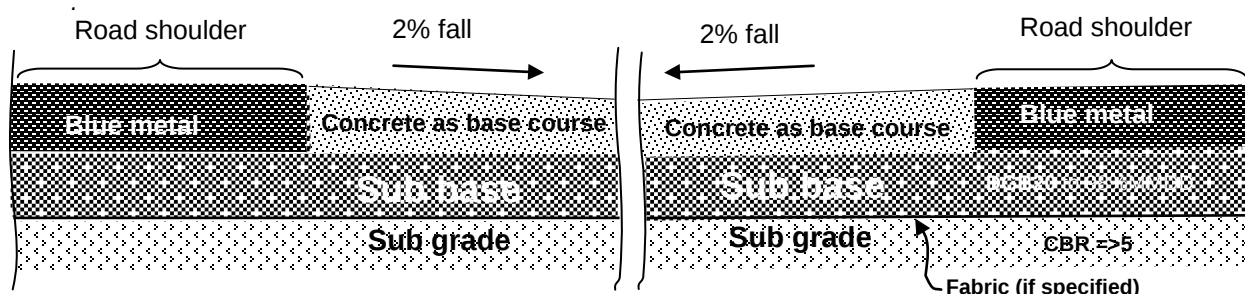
Cross section of typical general road layout with layers of sub grade, sub base, base or wearing course (reinforcements not shown)
